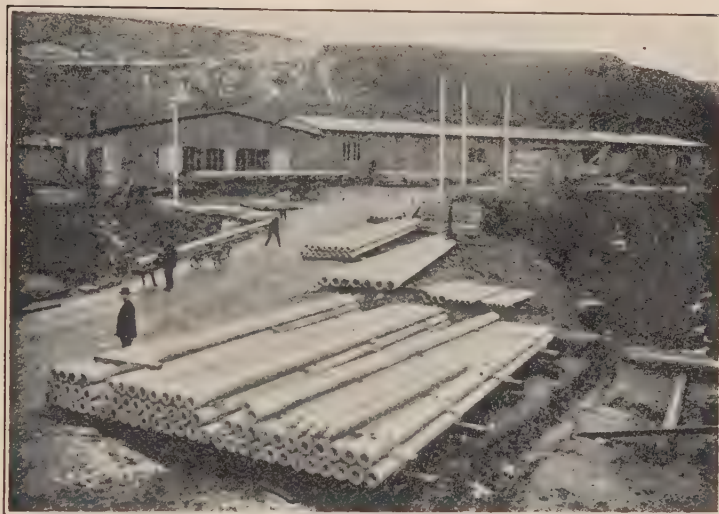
HOLLOW REINFORCED POLES, OTTO AND SCHLOSSER'S PLANT,
